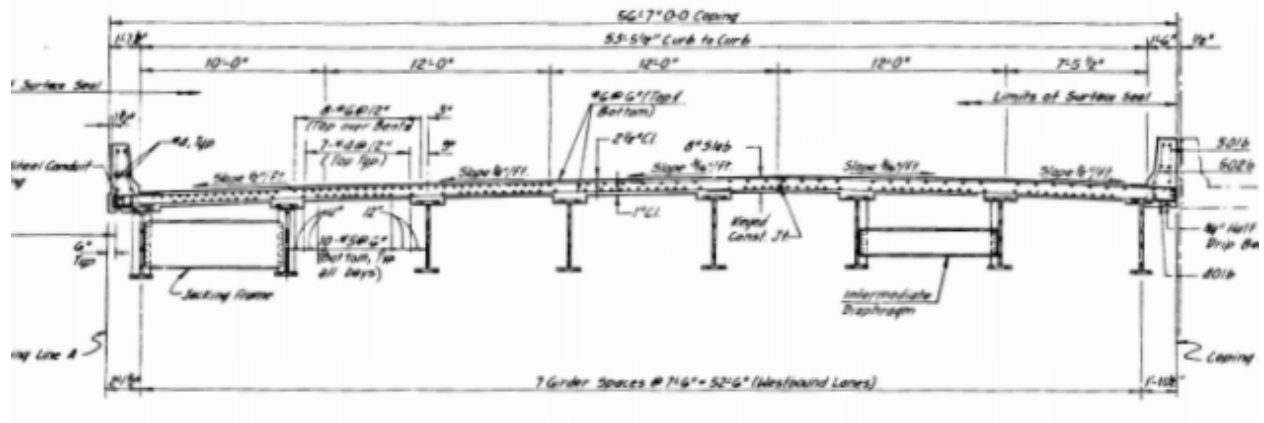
Typical Section of the Bridge (NBI 21985) (1984)
